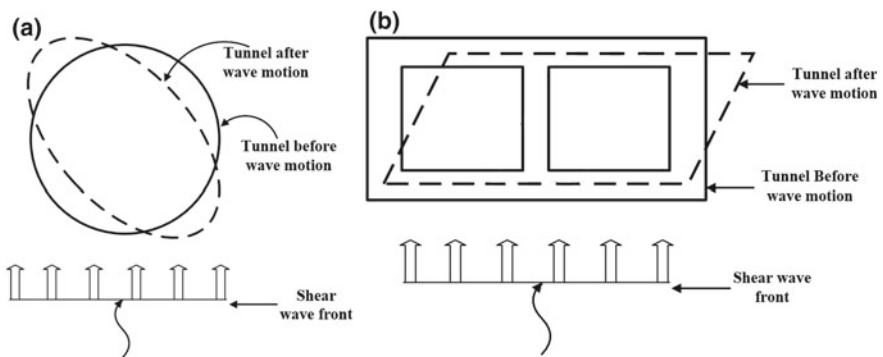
a Ovaling deformation in circular tunnel and b racking deformation in rectangular tunnel (Modified after Owen and Scholl [6])
